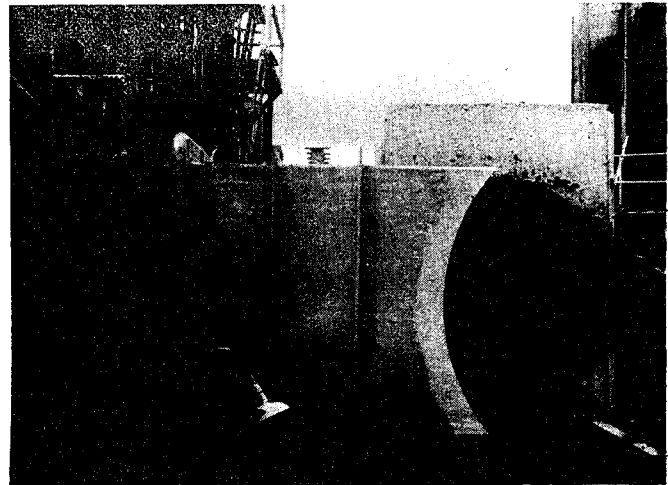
New fiberglass breeching at left with sanded edges ready for field welding of joints. Section of old duct is at right.
